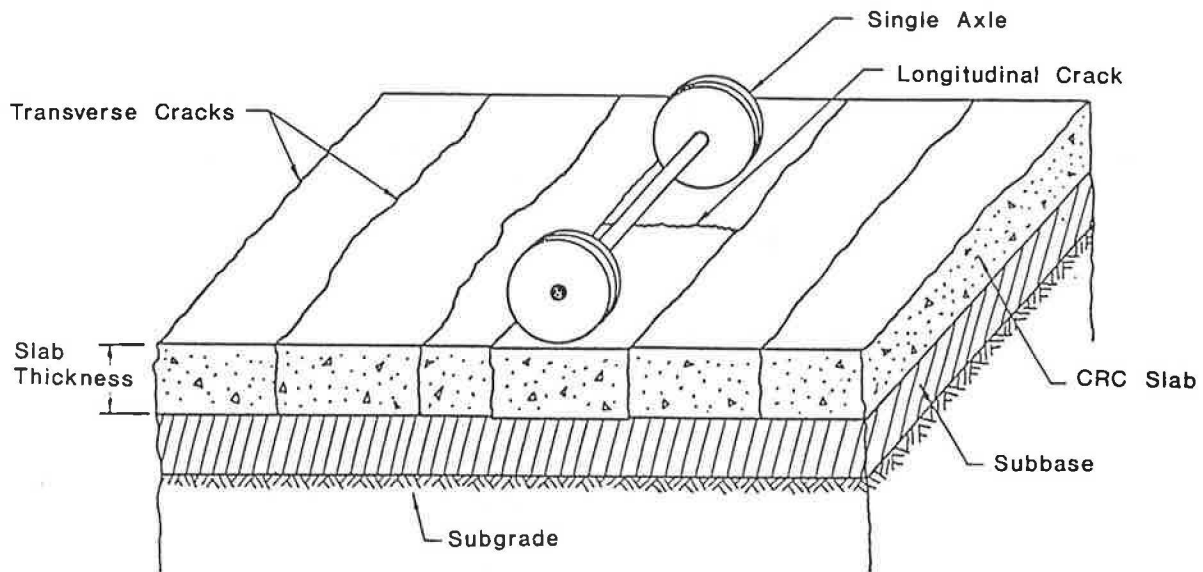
Formation of longitudinal crack between two transverse cracks; intermediate state of edge punchout (6).
